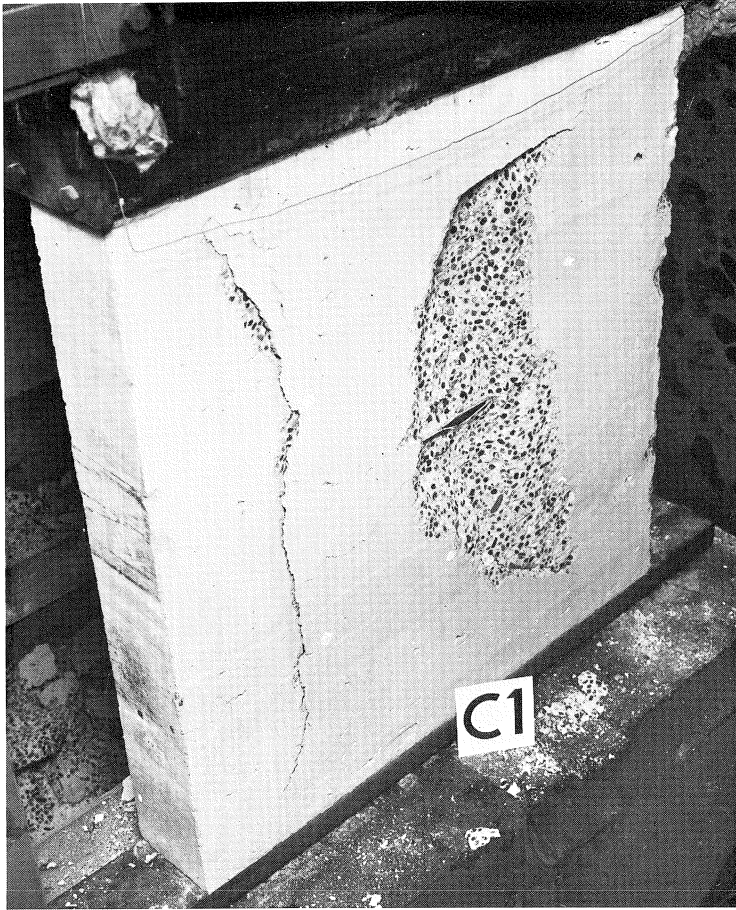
Slab-type lightweight concrete specimen after a fire test.
